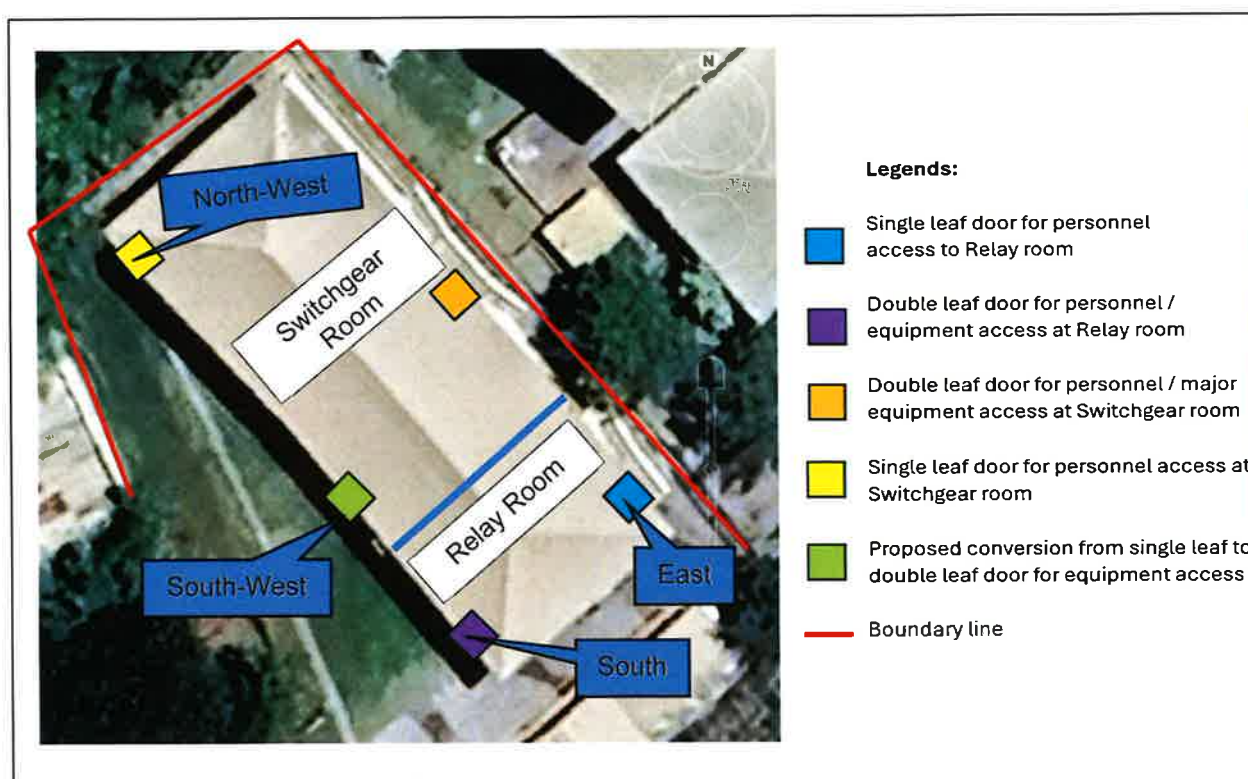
Existing door arrangements at Jerudong 66kV Main Substation Building
